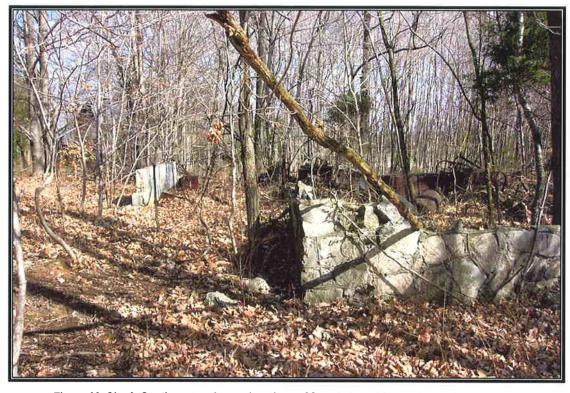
Site 3, Southwest and rear elevations of foundation of former house (Resource L).
